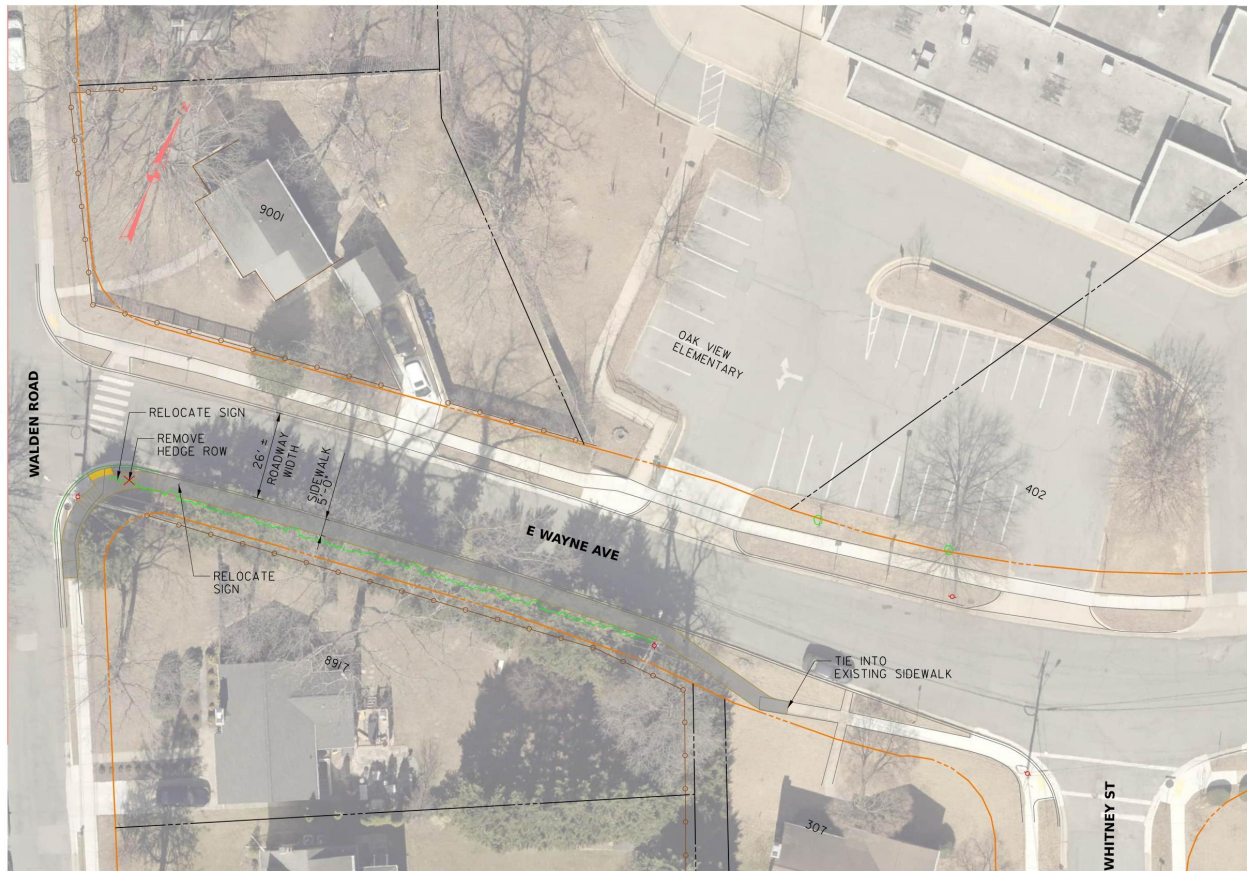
Aerial-based engineering plan depicting sidewalk improvements along Walden Road and E. Wayne Avenue adjacent to Oak View Elementary. The drawing shows the proposed 5-inch concrete sidewalk alignment highlighted along the roadway edge, ADA-compliant curb ramps at intersections, detectable warning surfaces at ramp transitions, sections of retaining wall, new curb construction, driveway connections, and the approximate right-of-way boundary. Street names, property outlines, and tie-in points to existing sidewalks are labeled within the plan view.
